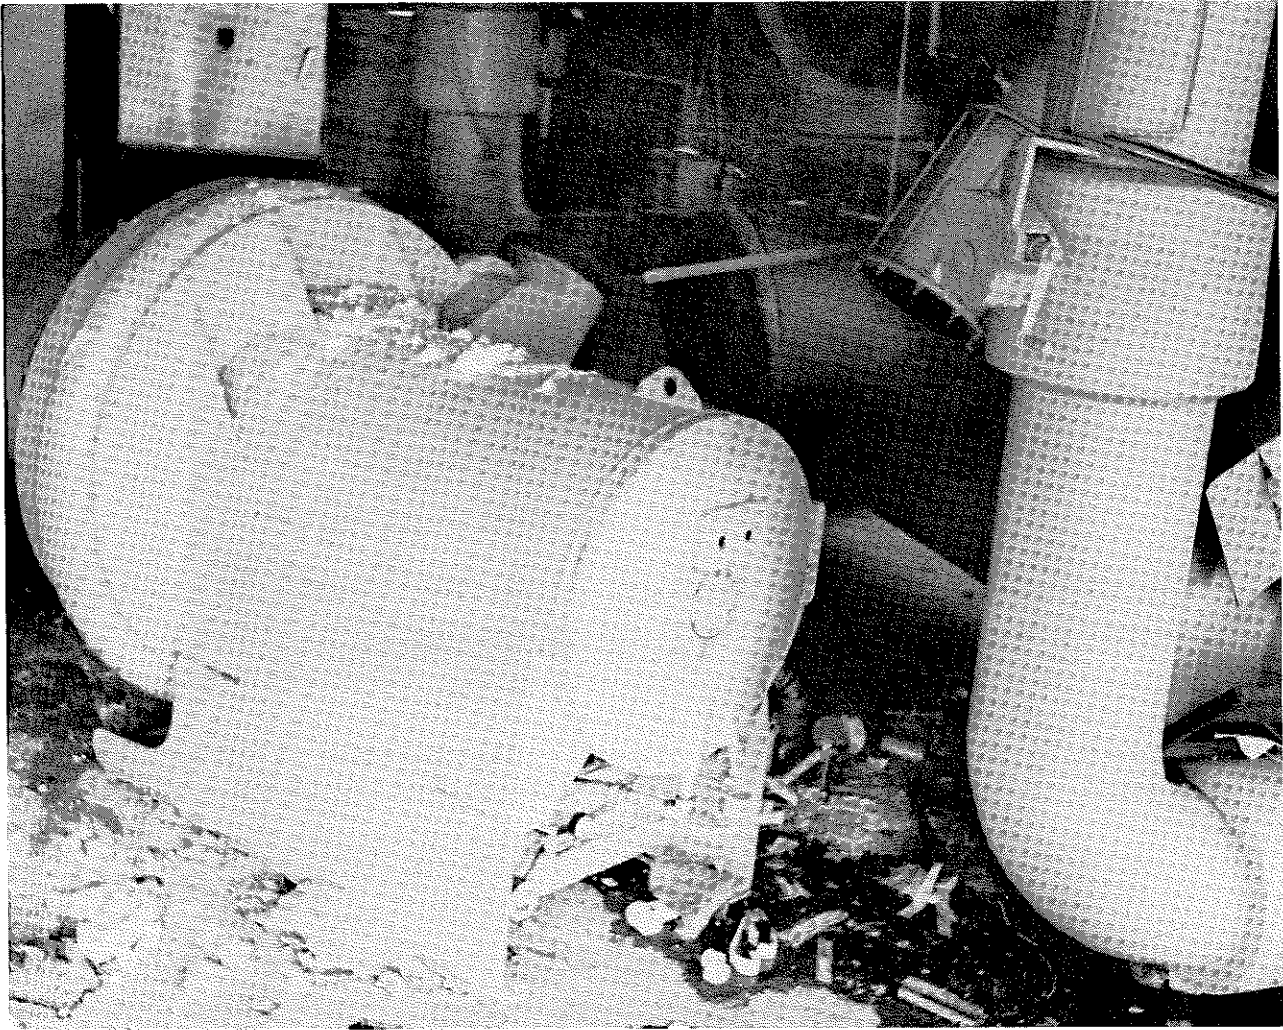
Equipment that was not bolted to the floor in the Olive View Central Heating and Refrigeration Plant moved about.
